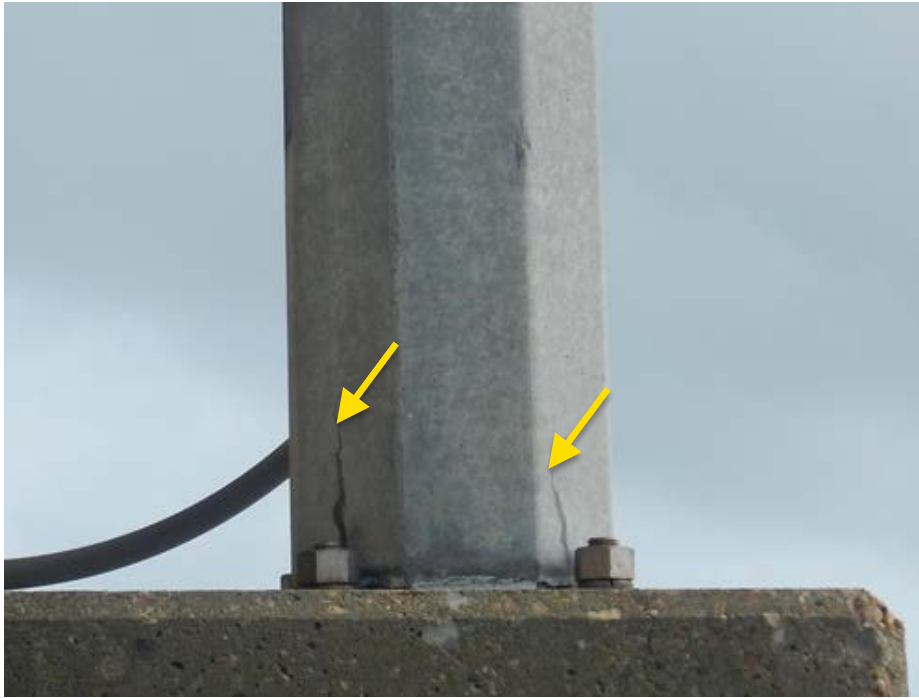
CNB159 Light Pole – Cracking at Baseplate (Looking North)
